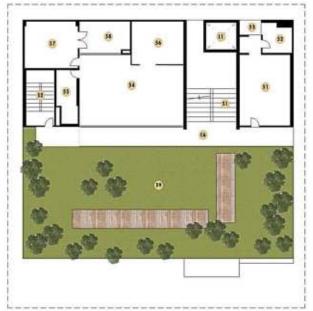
Top Floor Plan of HACHI Serviced Apartment
